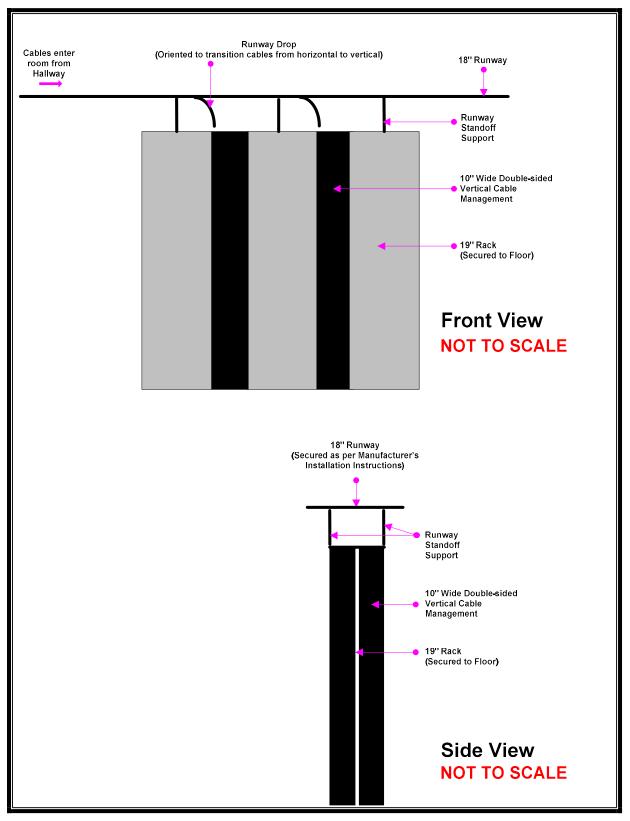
Horizontal Cross-Connect Front and Side View Rack Layout
